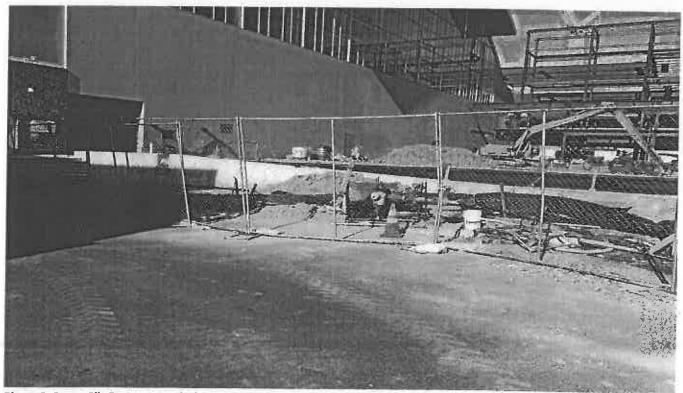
Super Silt Fence overwhelmed with pile of sediment North of the site
